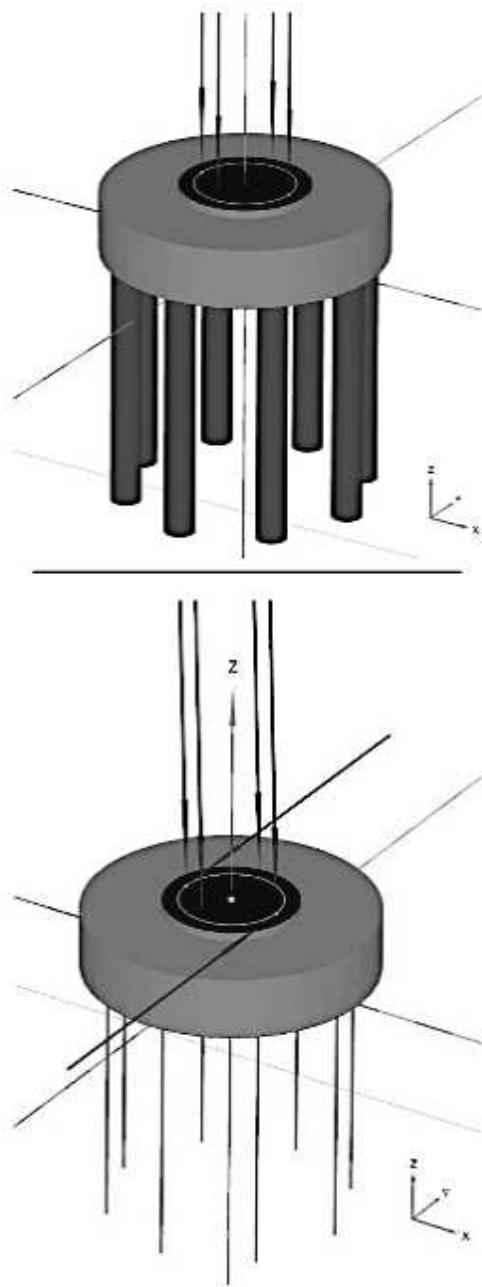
a) piles as volumetric elements and b) piles as embedded beams.
